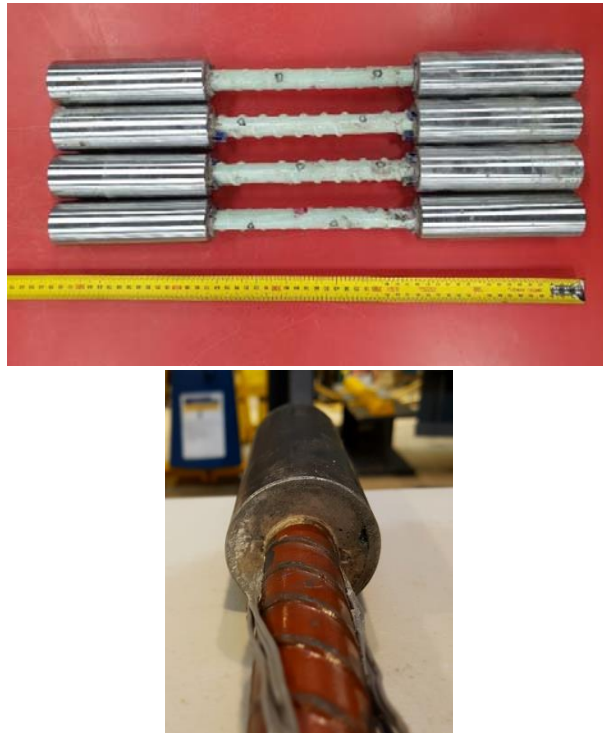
Pull-out samples; FRP bolt samples (left) and steel bolt samples (right)
